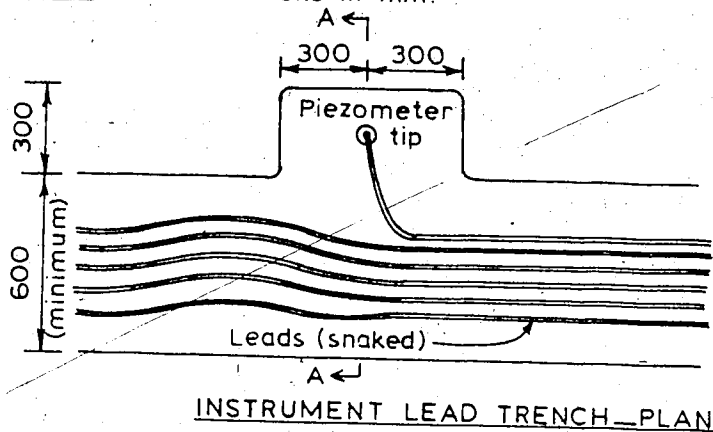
Instrument-Lead Trench and Riser Detail
